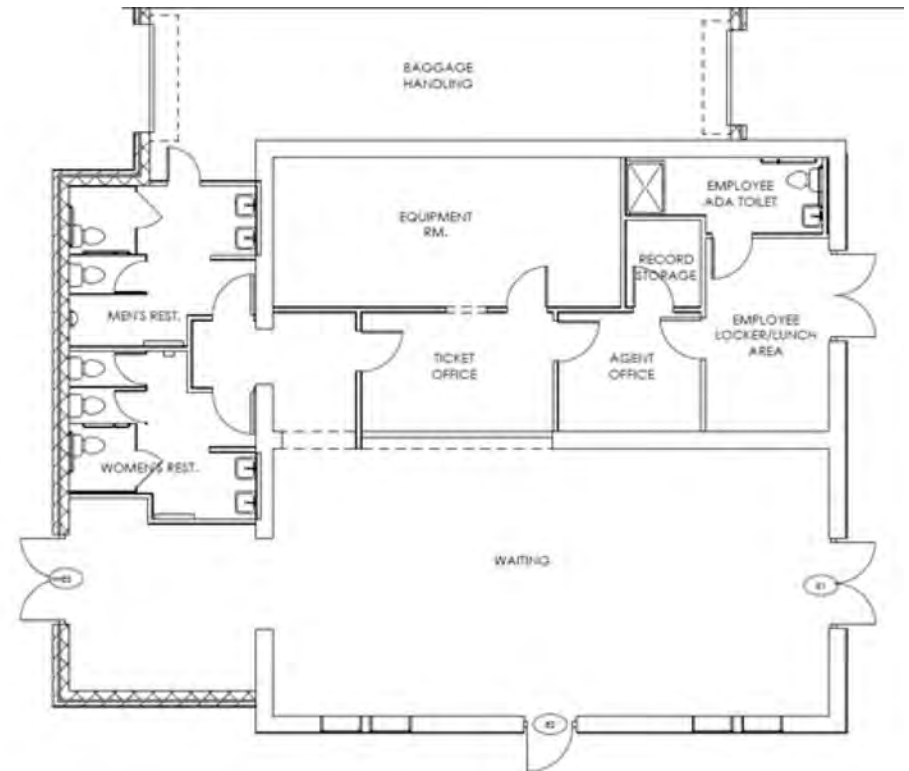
Existing layout of Charlottesville Amtrak Station. Drawings: BRW Architects.
